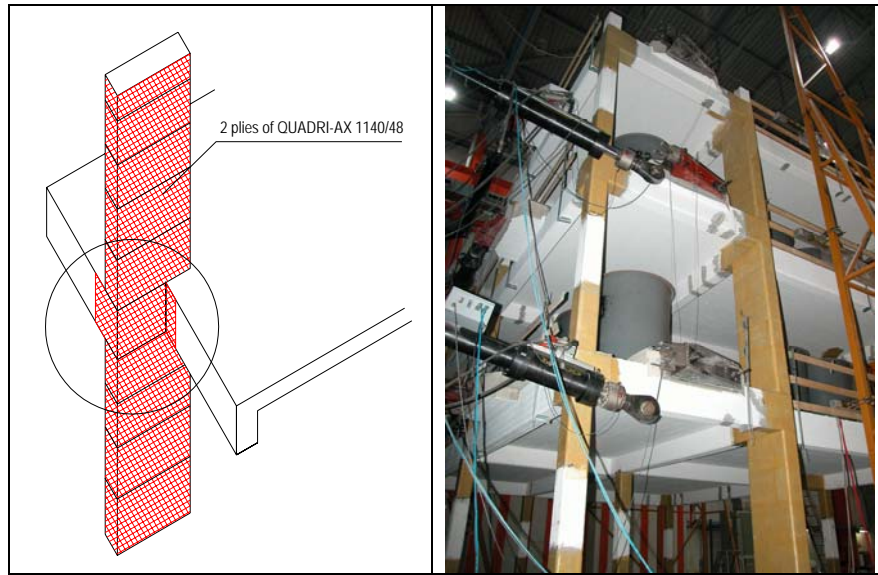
Shear strength of wall-type column C6 and retrofitted structure overview
